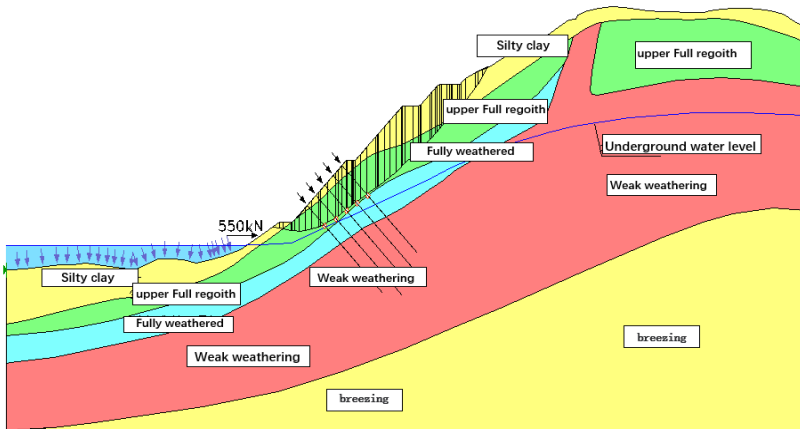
Schematic diagram of artificial slope sliding surface at the entrance of traffic tunnel (C-C artificial slope has reinforcement measures, under normal conditions.)
